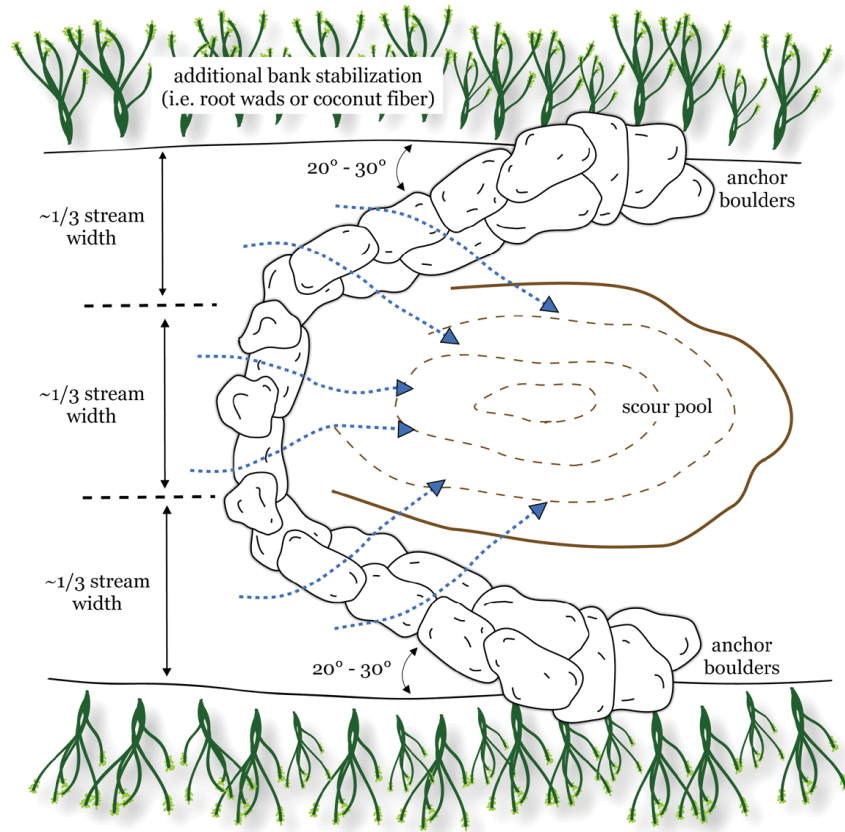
Typical cross vane installation (after Rosgen, 2006).
